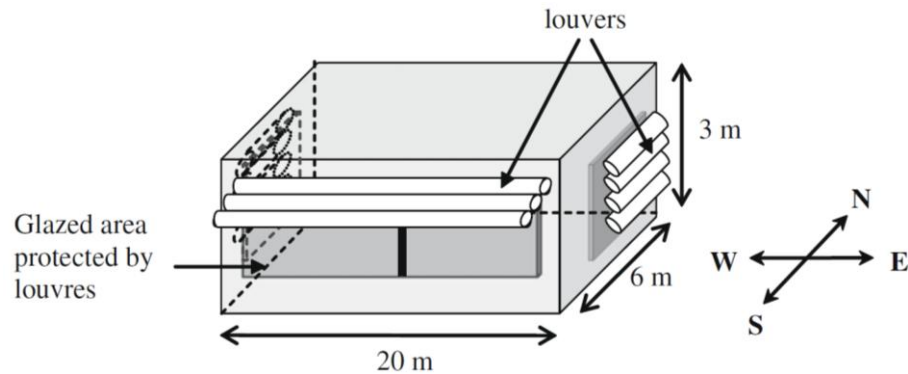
Use of louvers to protect glazed surfaces (horizontal layout in a south façade and vertical layout in east or west façades (Palmero-Marrero and Oliveira, 2010)
